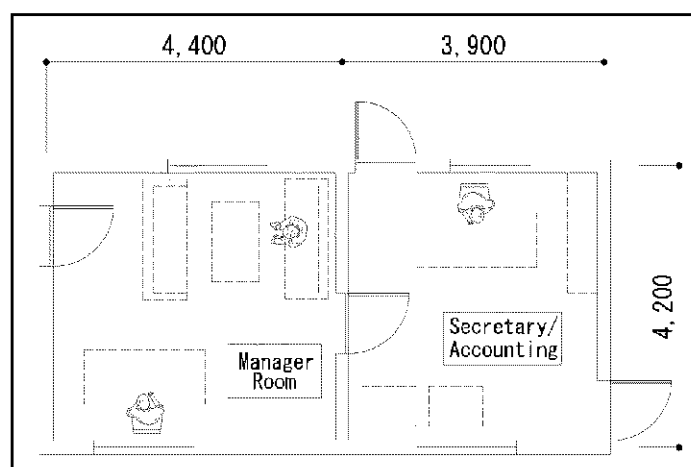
2.2(23) Layout for Manager Room and Secretary/Accounting Room
